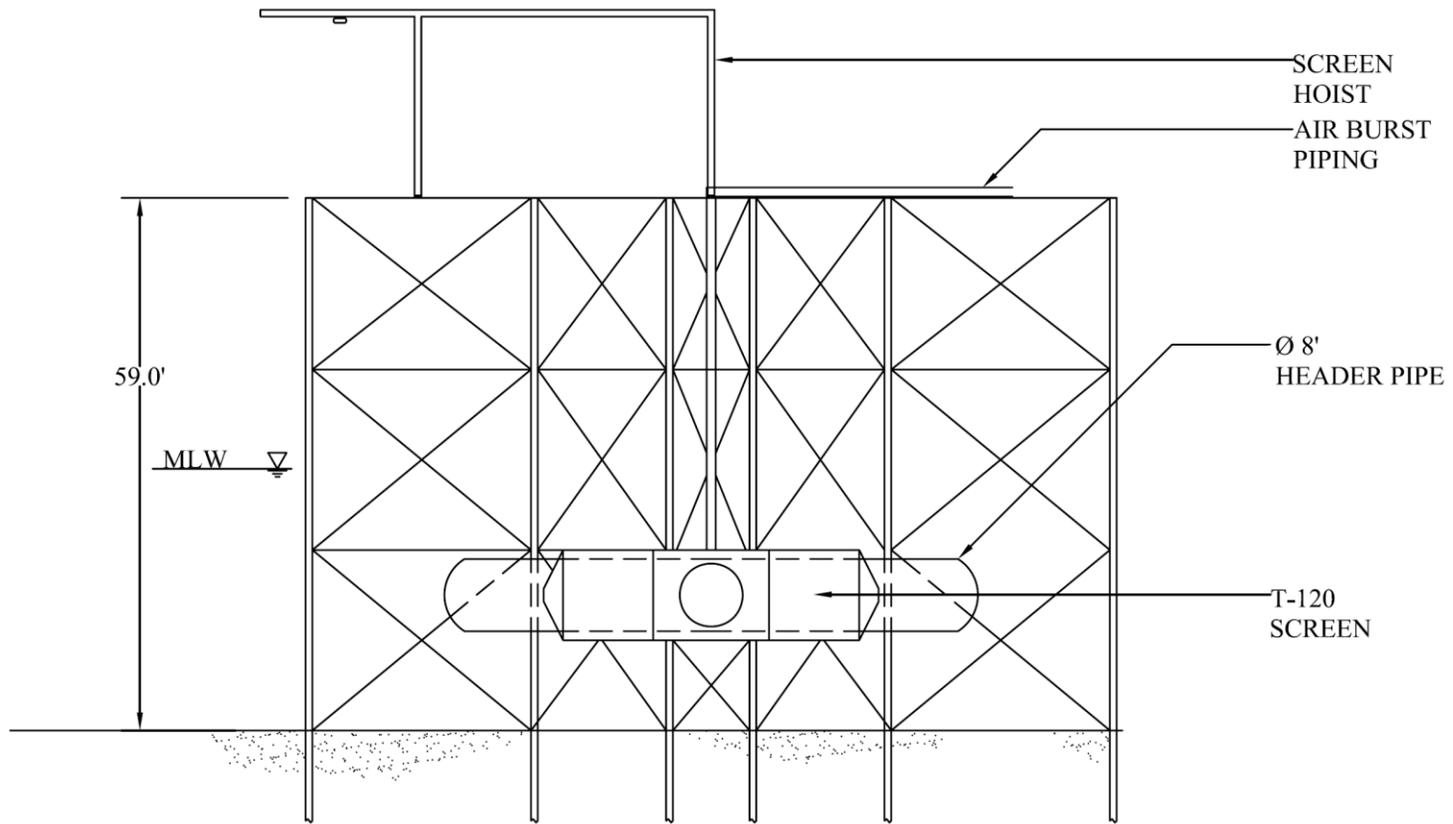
Wedgewire Layout 3 "Pipe-mount"- Plan
